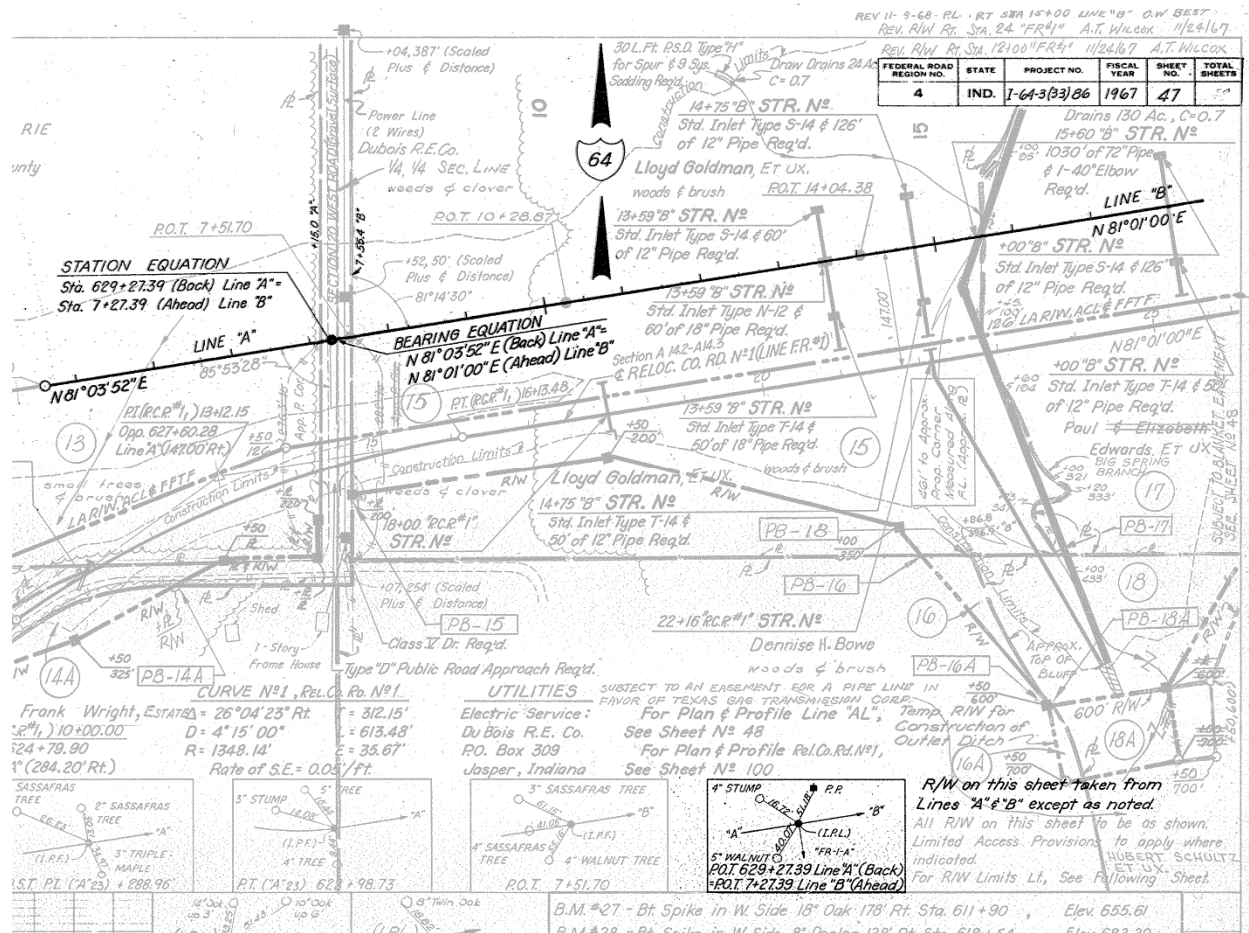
Interstate 64 Design Plan Sheet.
